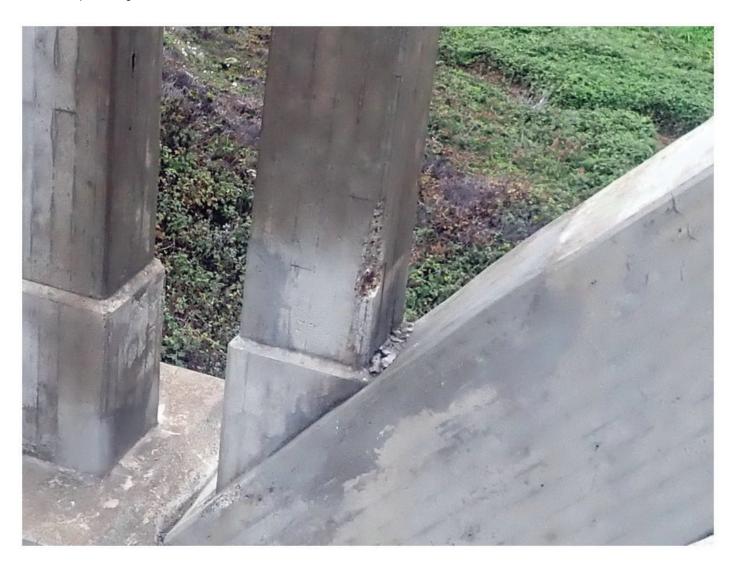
Corner spall at the upstation and right faces of Column 1 of Spandrel Bent 1.
